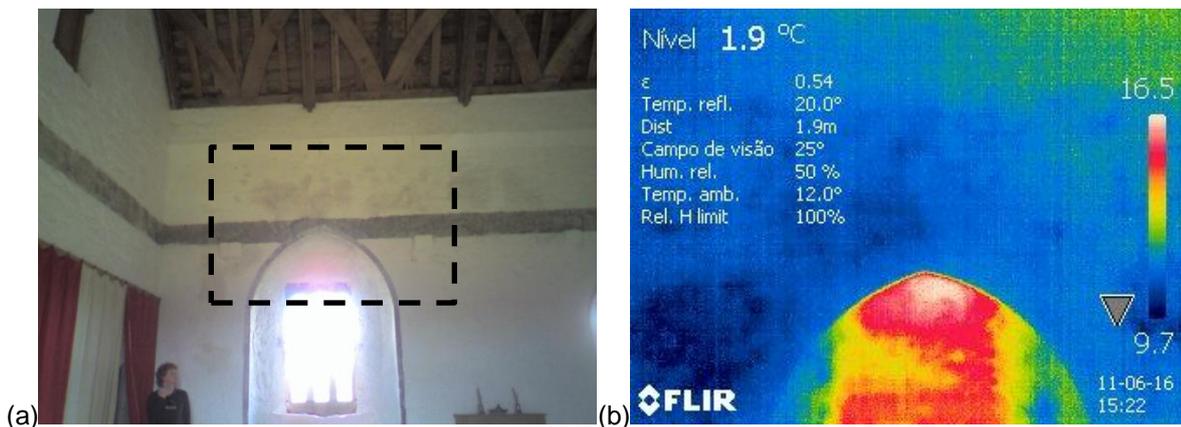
Moisture behind staining above northern window on east wall of Great Chamber
